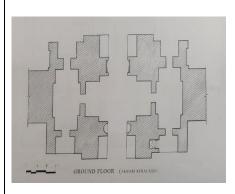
Plan of Jahangir's Tomb Gateway (Akbari Serai) Source:
